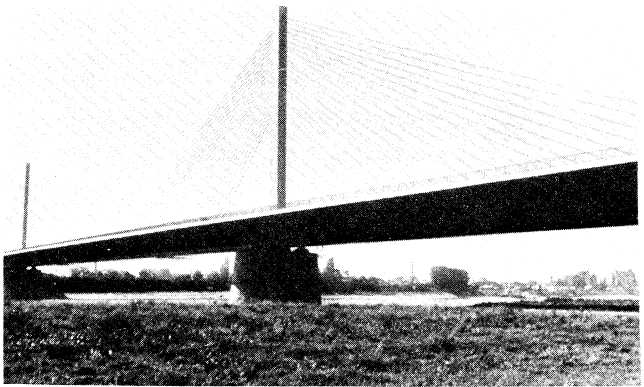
Friedrich-Ebert Bonn Nord Bridge (Courtesy of Beratungsstelle Für Stahlverwendung, Dr.-Ing. H. Odenhausen)
